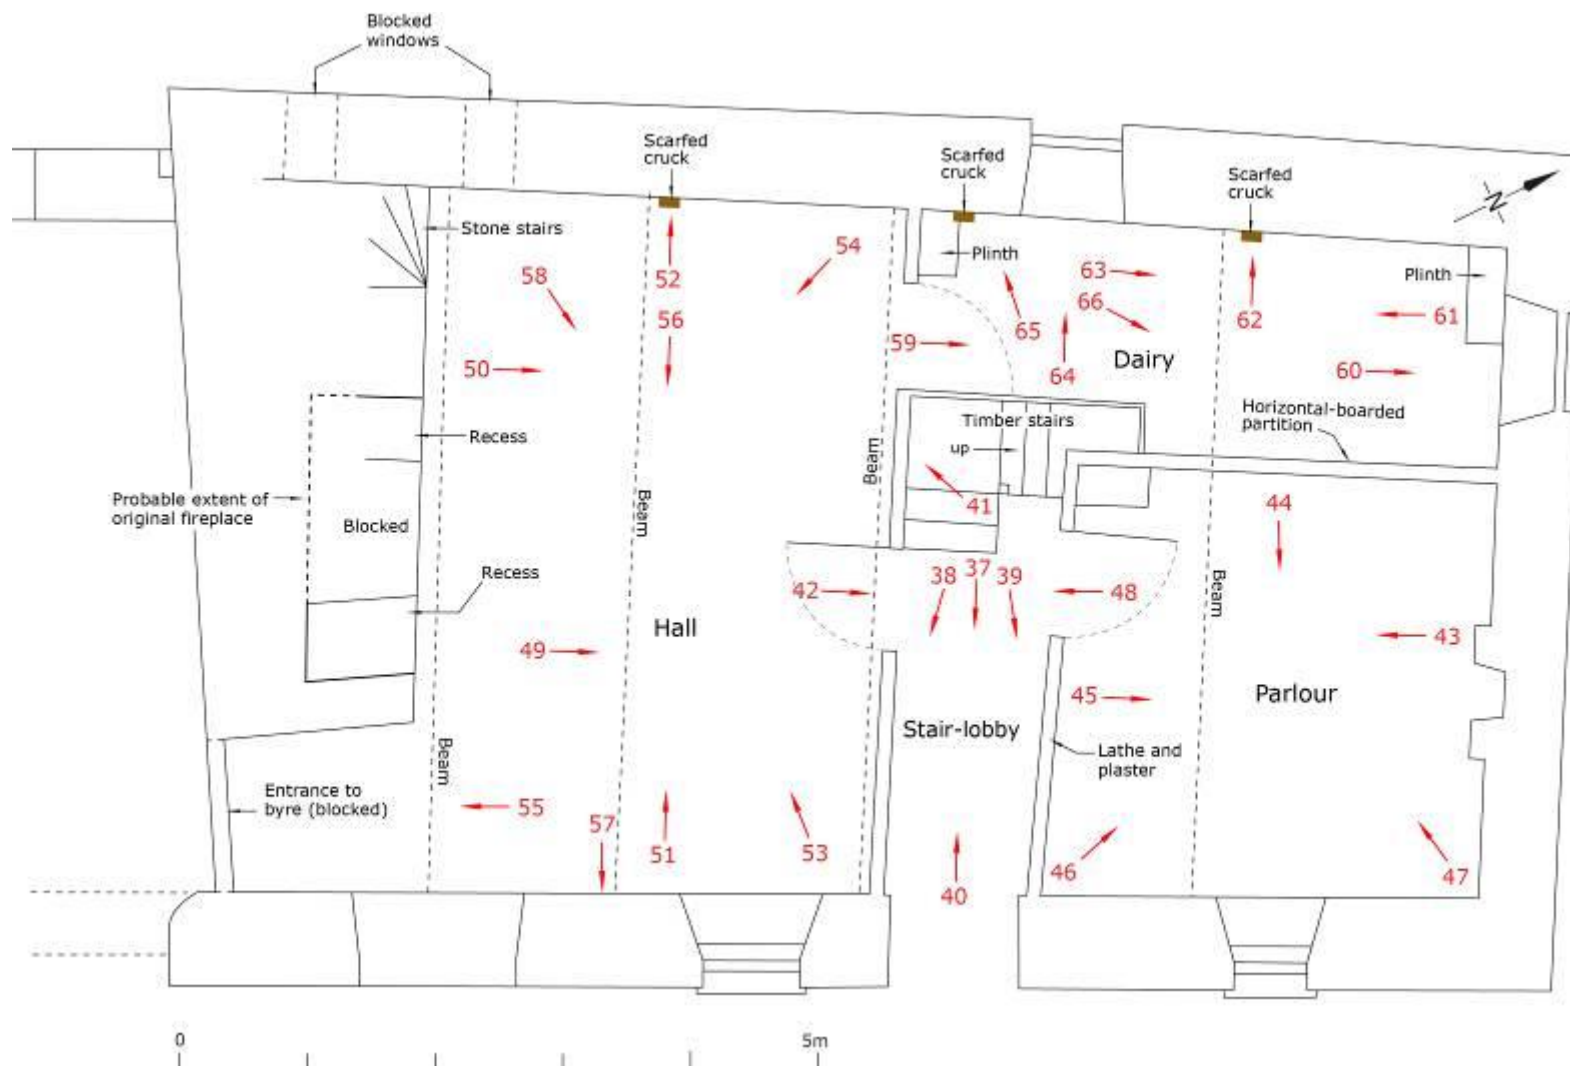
Floor plan of ground floor of house showing number and direction of photos
